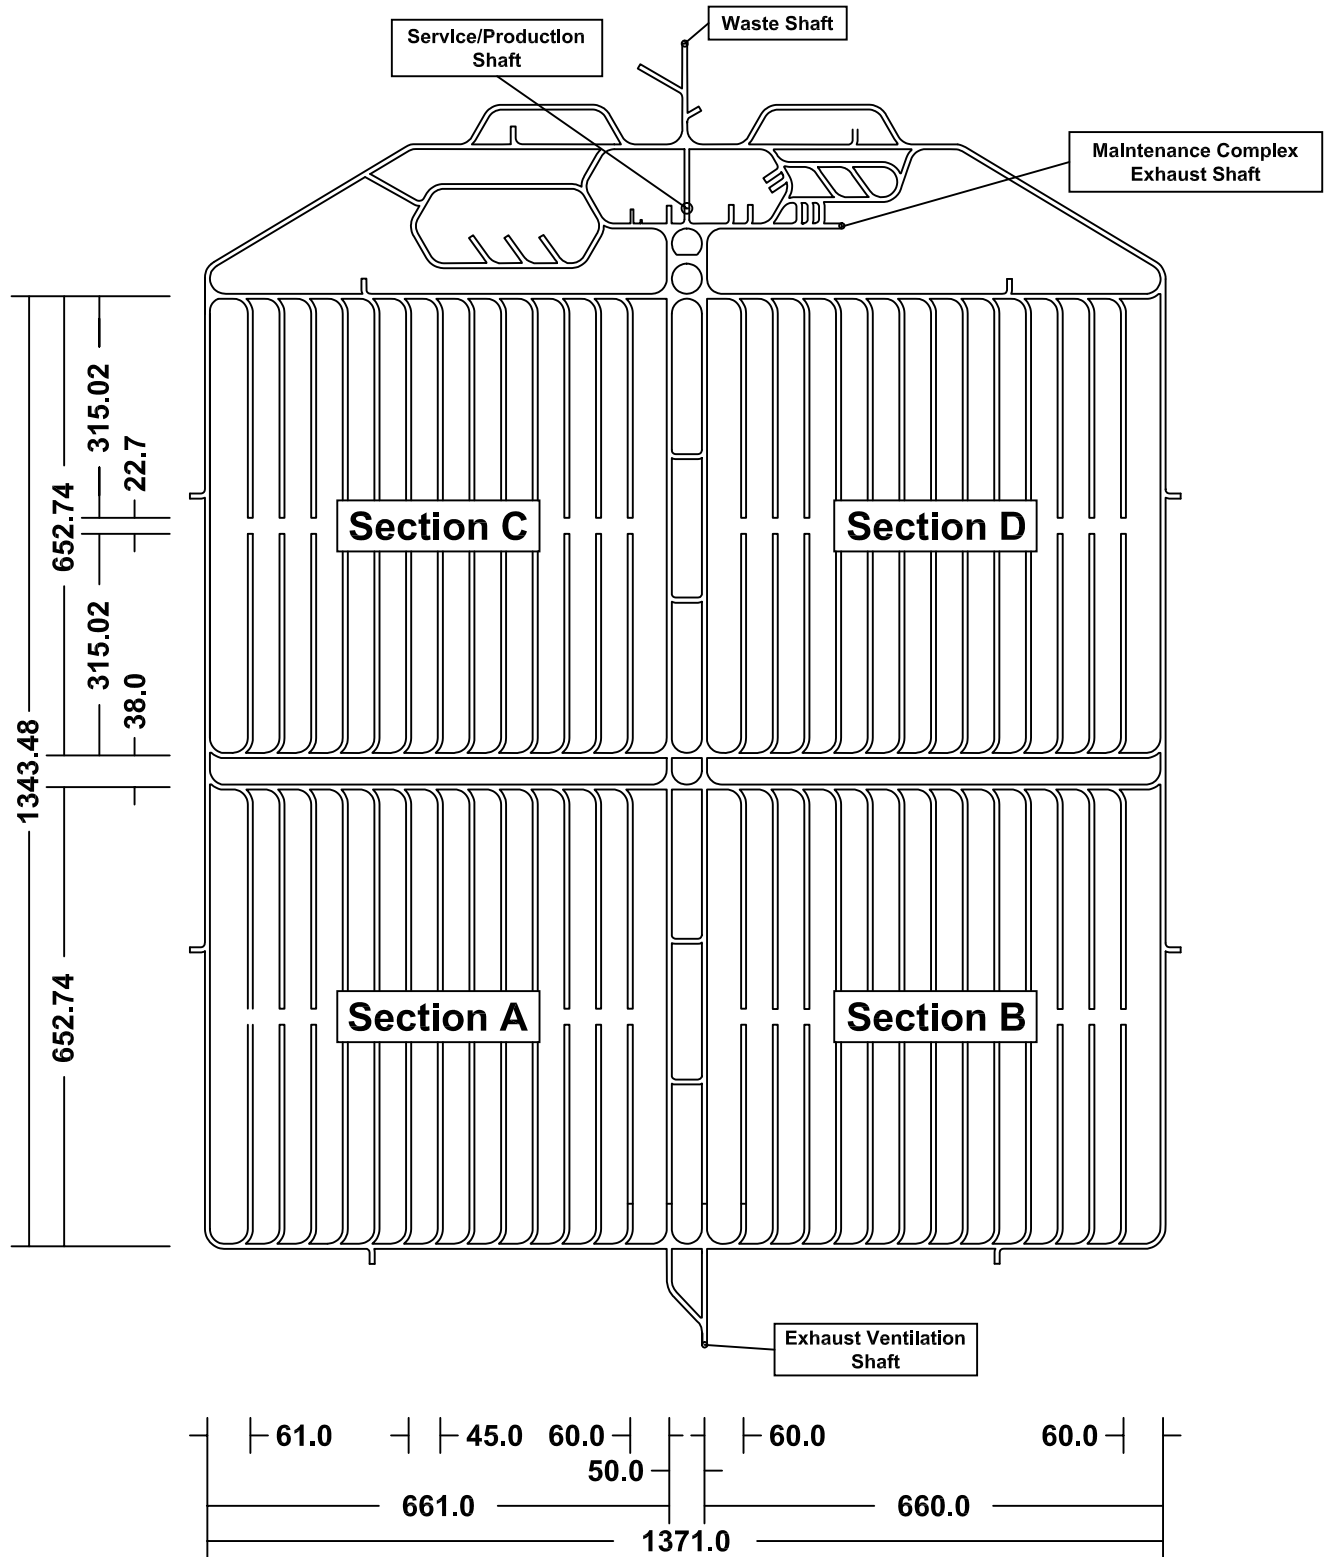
GENERAL LAYOUT - PROPOSED PLAN OF DEEP GEOLOGIC REPOSITORY
